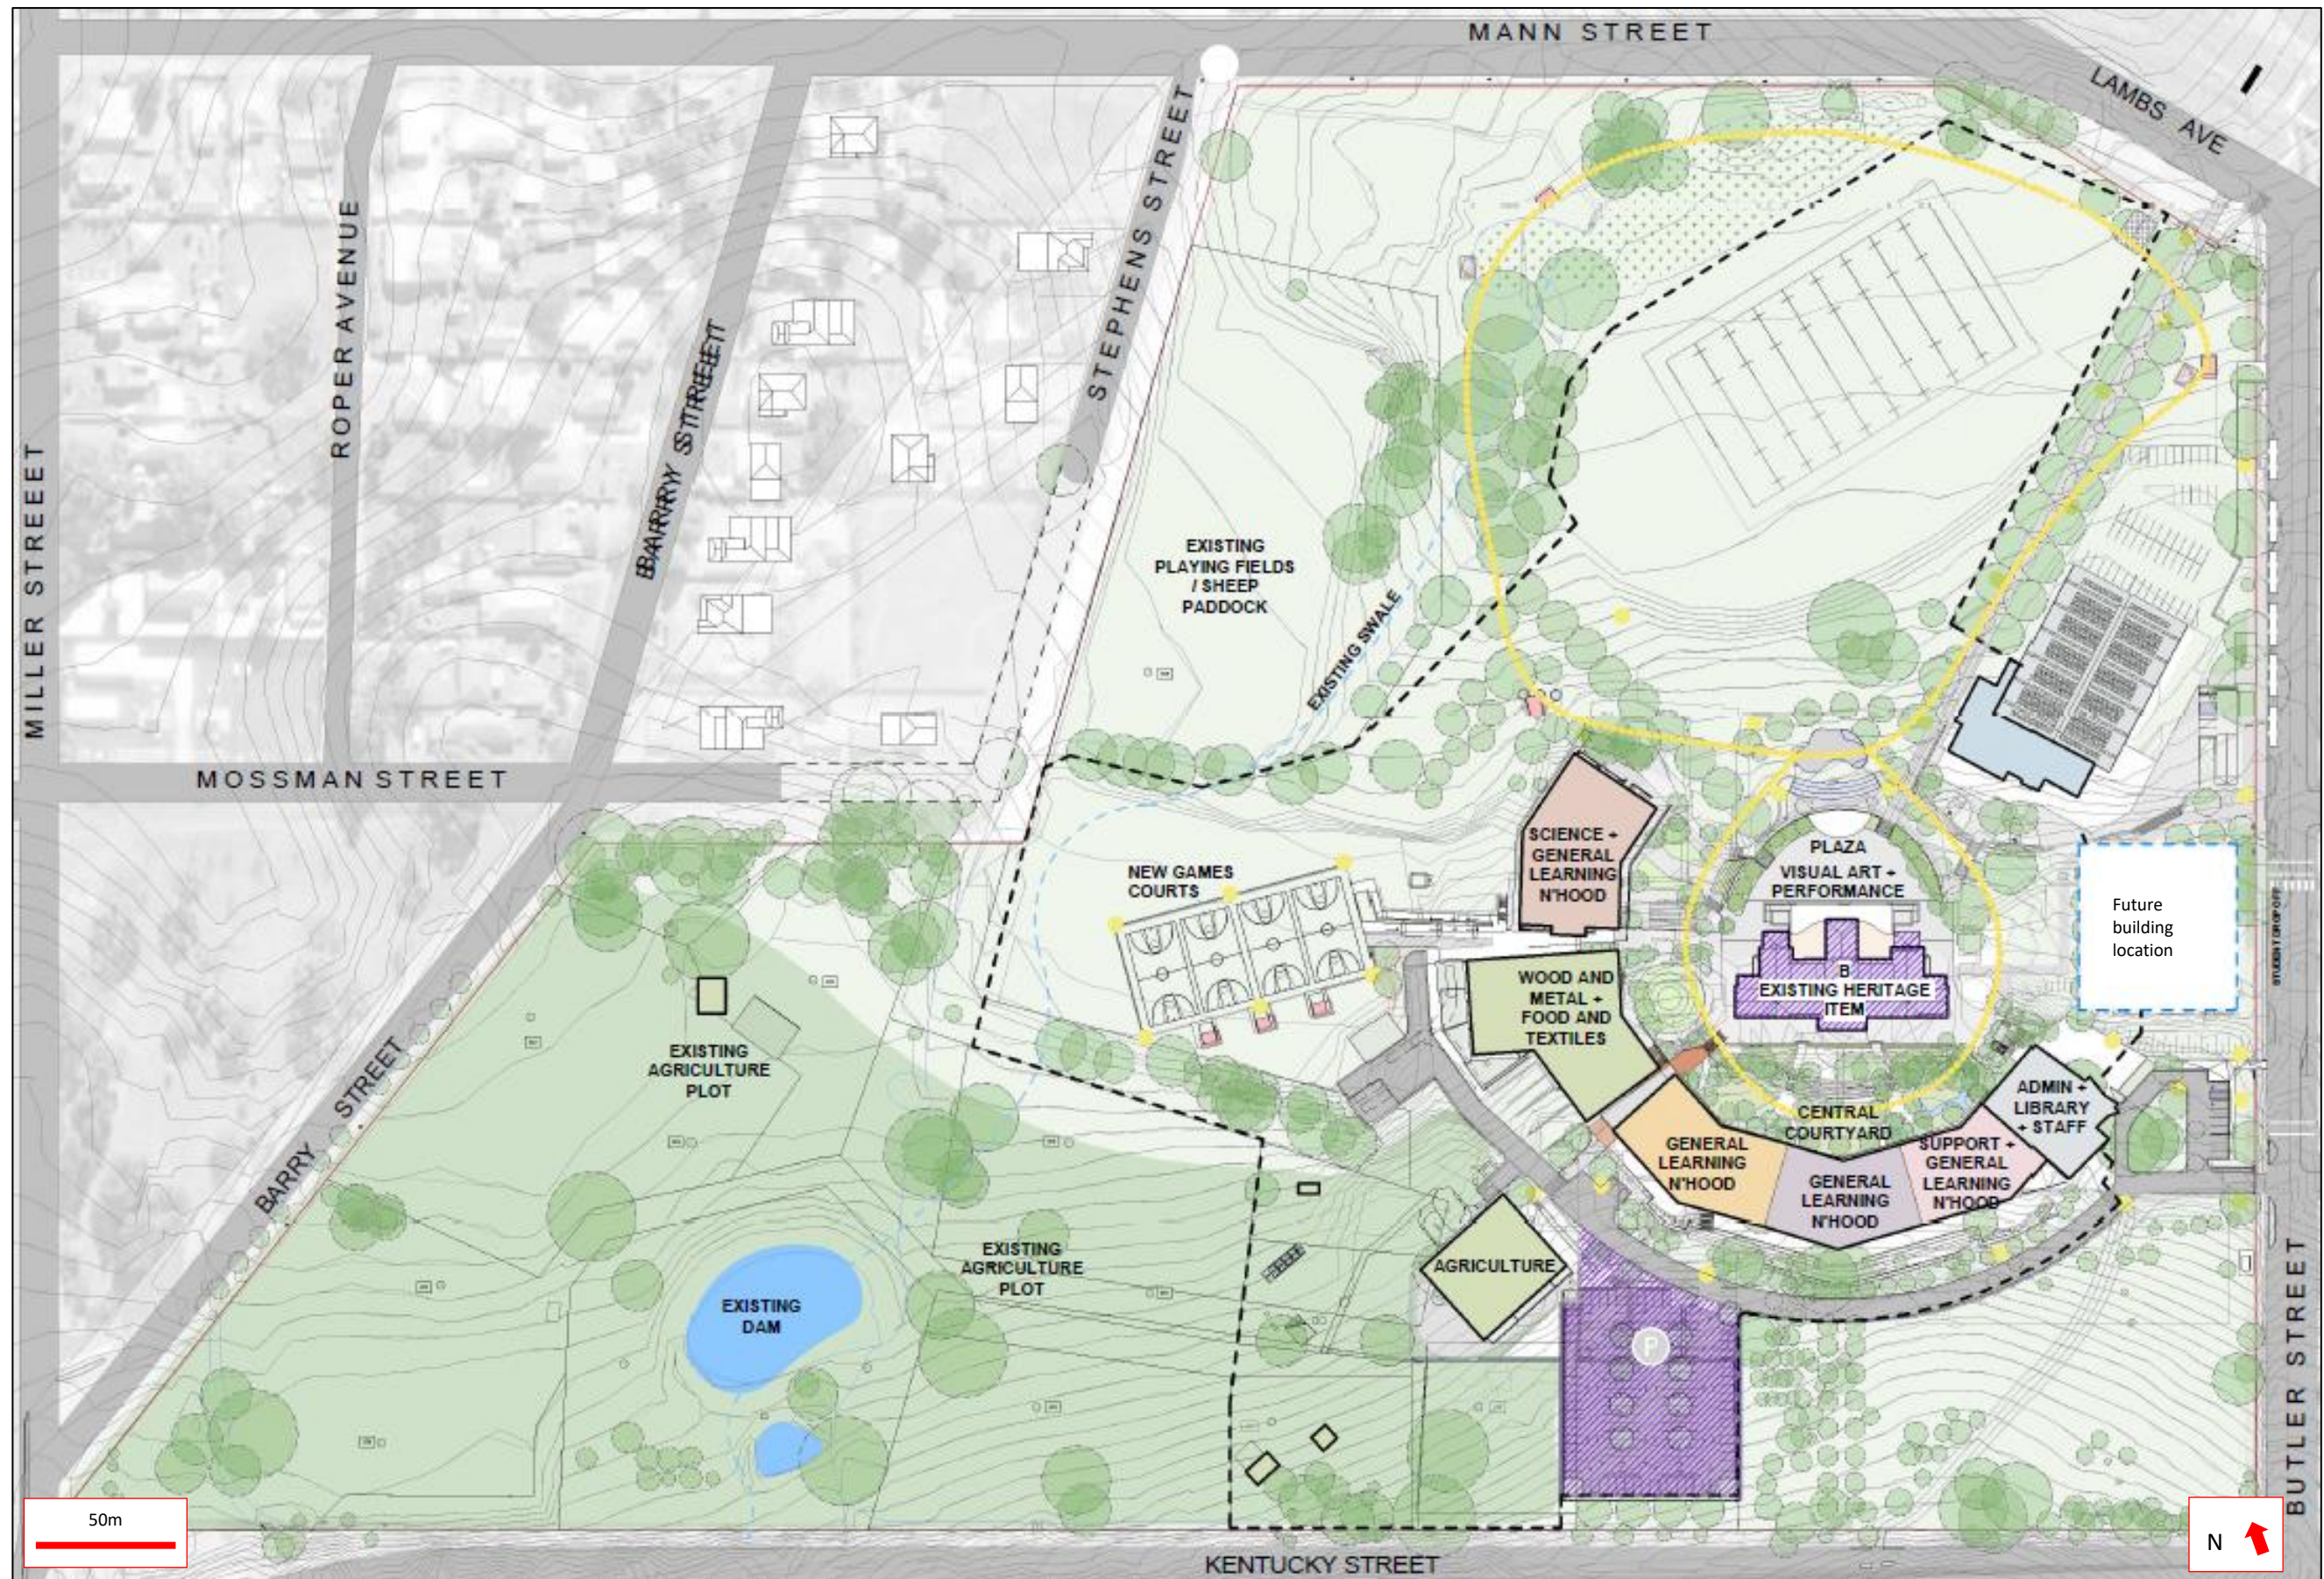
Proposed site layout (Base source: SRTS, 2019)
